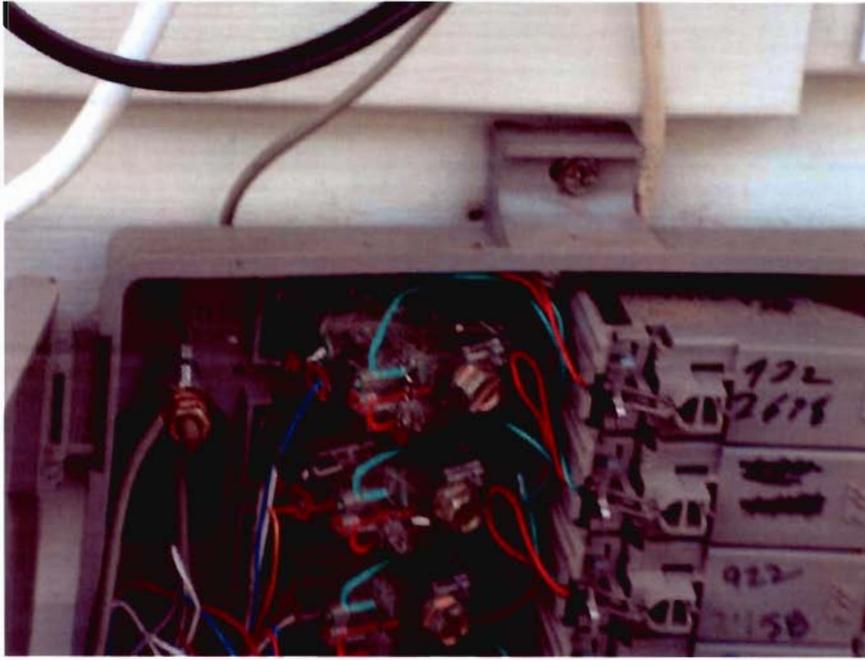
Pole # 16, [REDACTED] Laurel Hollow Road.
